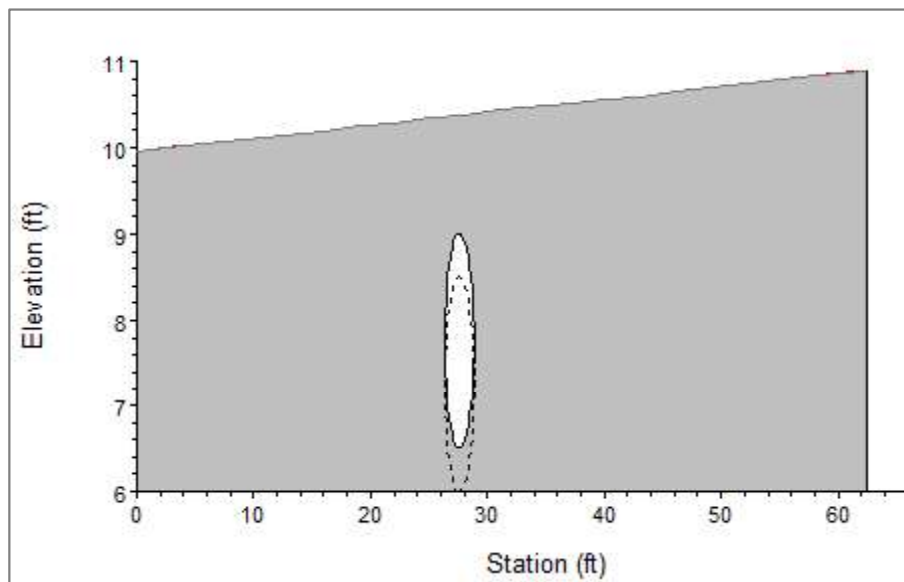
Proposed Culvert #2 Cross-Section on Kaihalulu East Roadway
